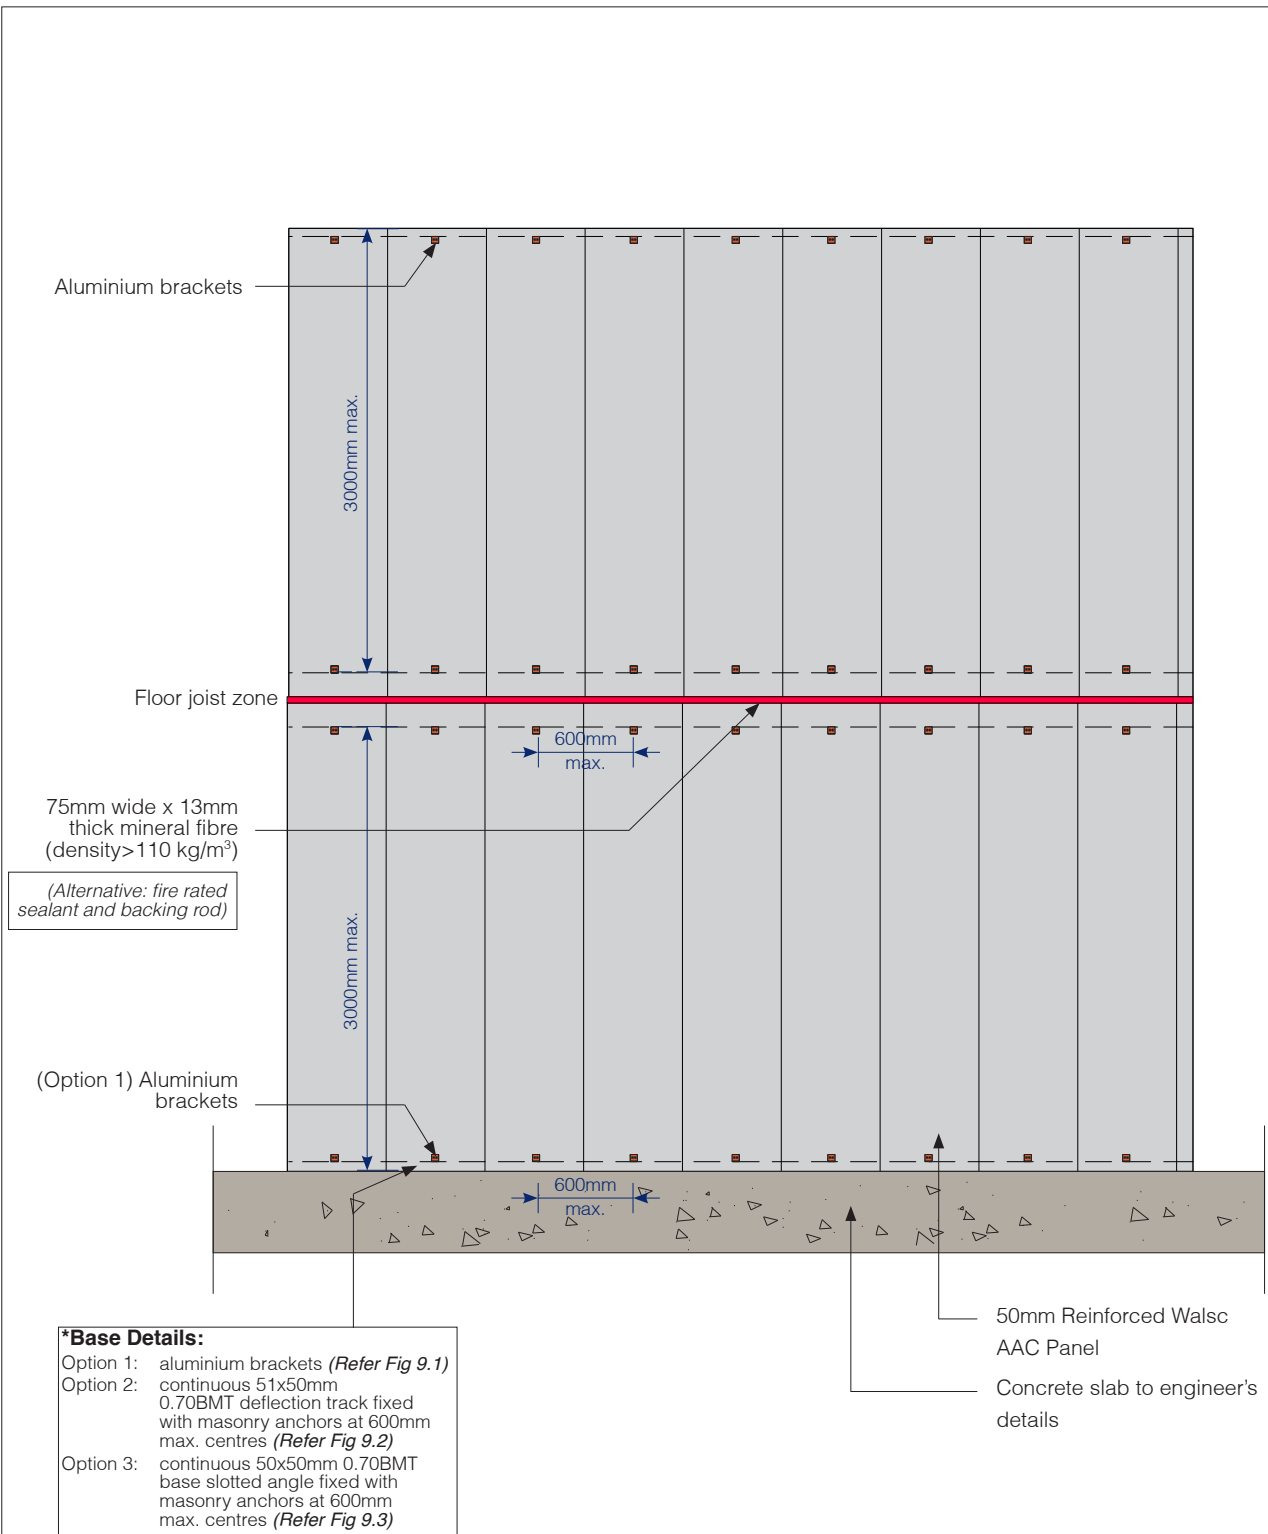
Vertically Aligned System Panel Orientation Elevation Detail
